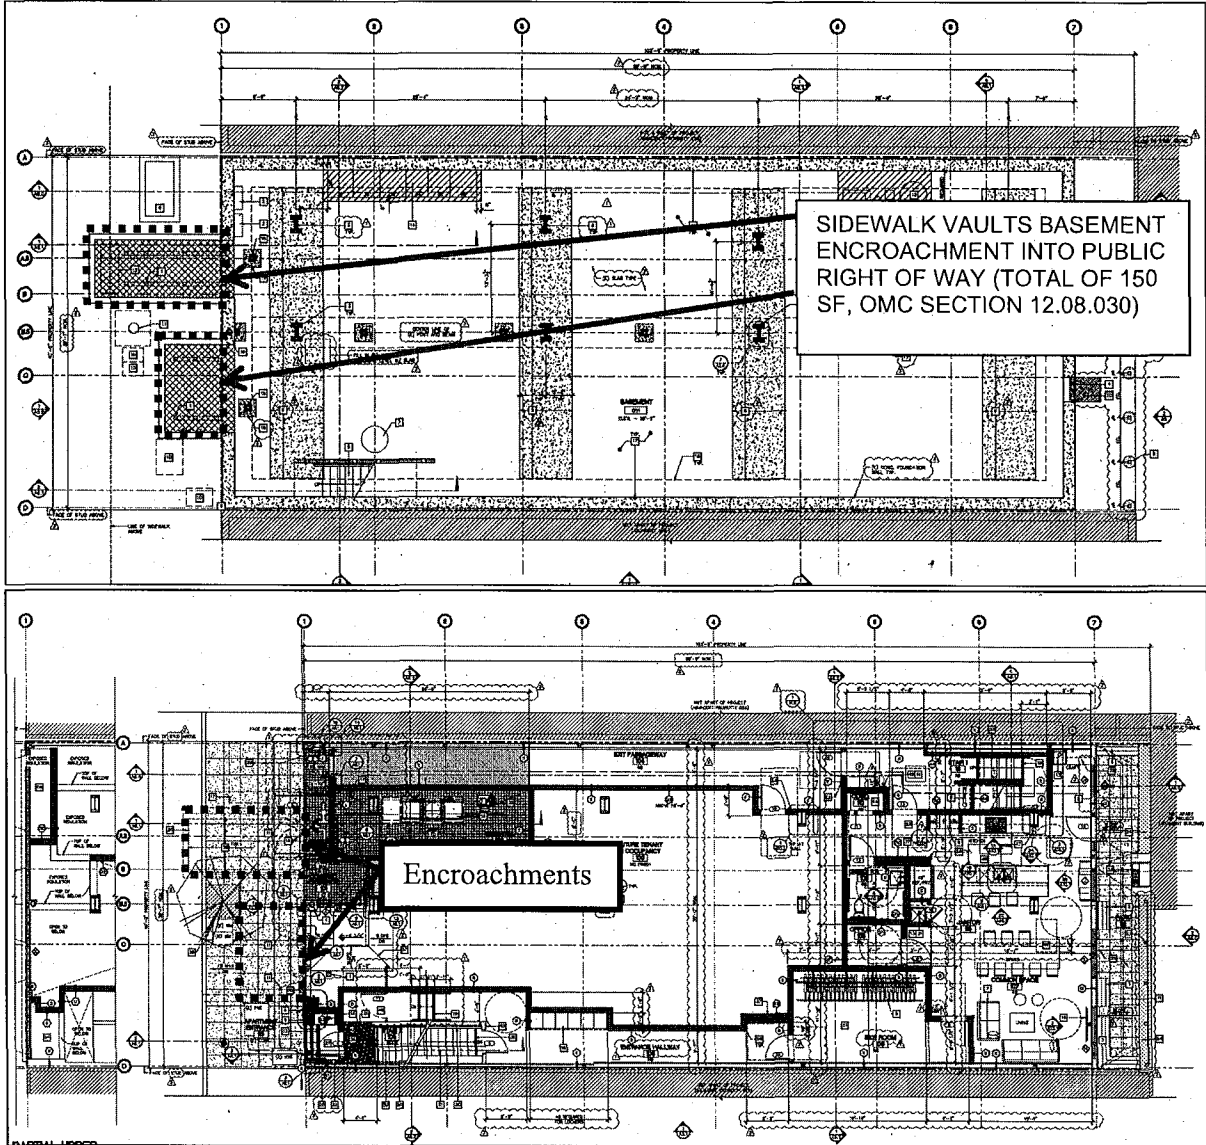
of 2): 622 14th Street ENCROACHMENT
